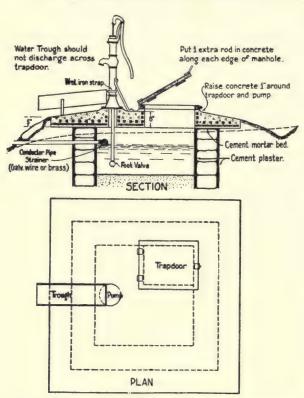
INCLOSED SPRING WITH CONCRETE PLATFORM AND TRENCH TO PREVENT SURFACE WATER FROM ENTERING THE SPRING (Pennsylvania State Department of Health.)
